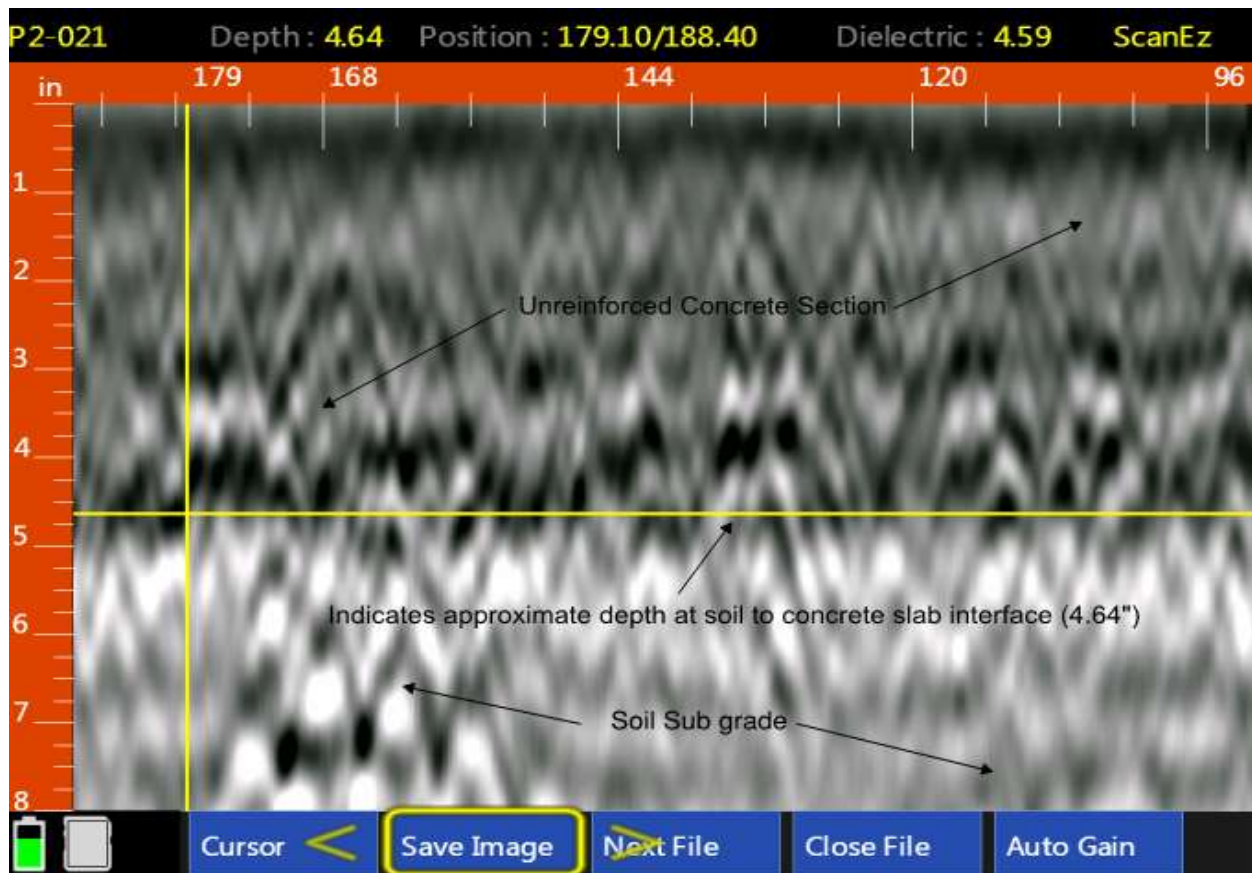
Radiogram view of garage floor slab showing interpreted concrete section thickness (roughly 4½" thickness). The radiograms gathered for the garage slab showed no evidence of steel reinforcement.
